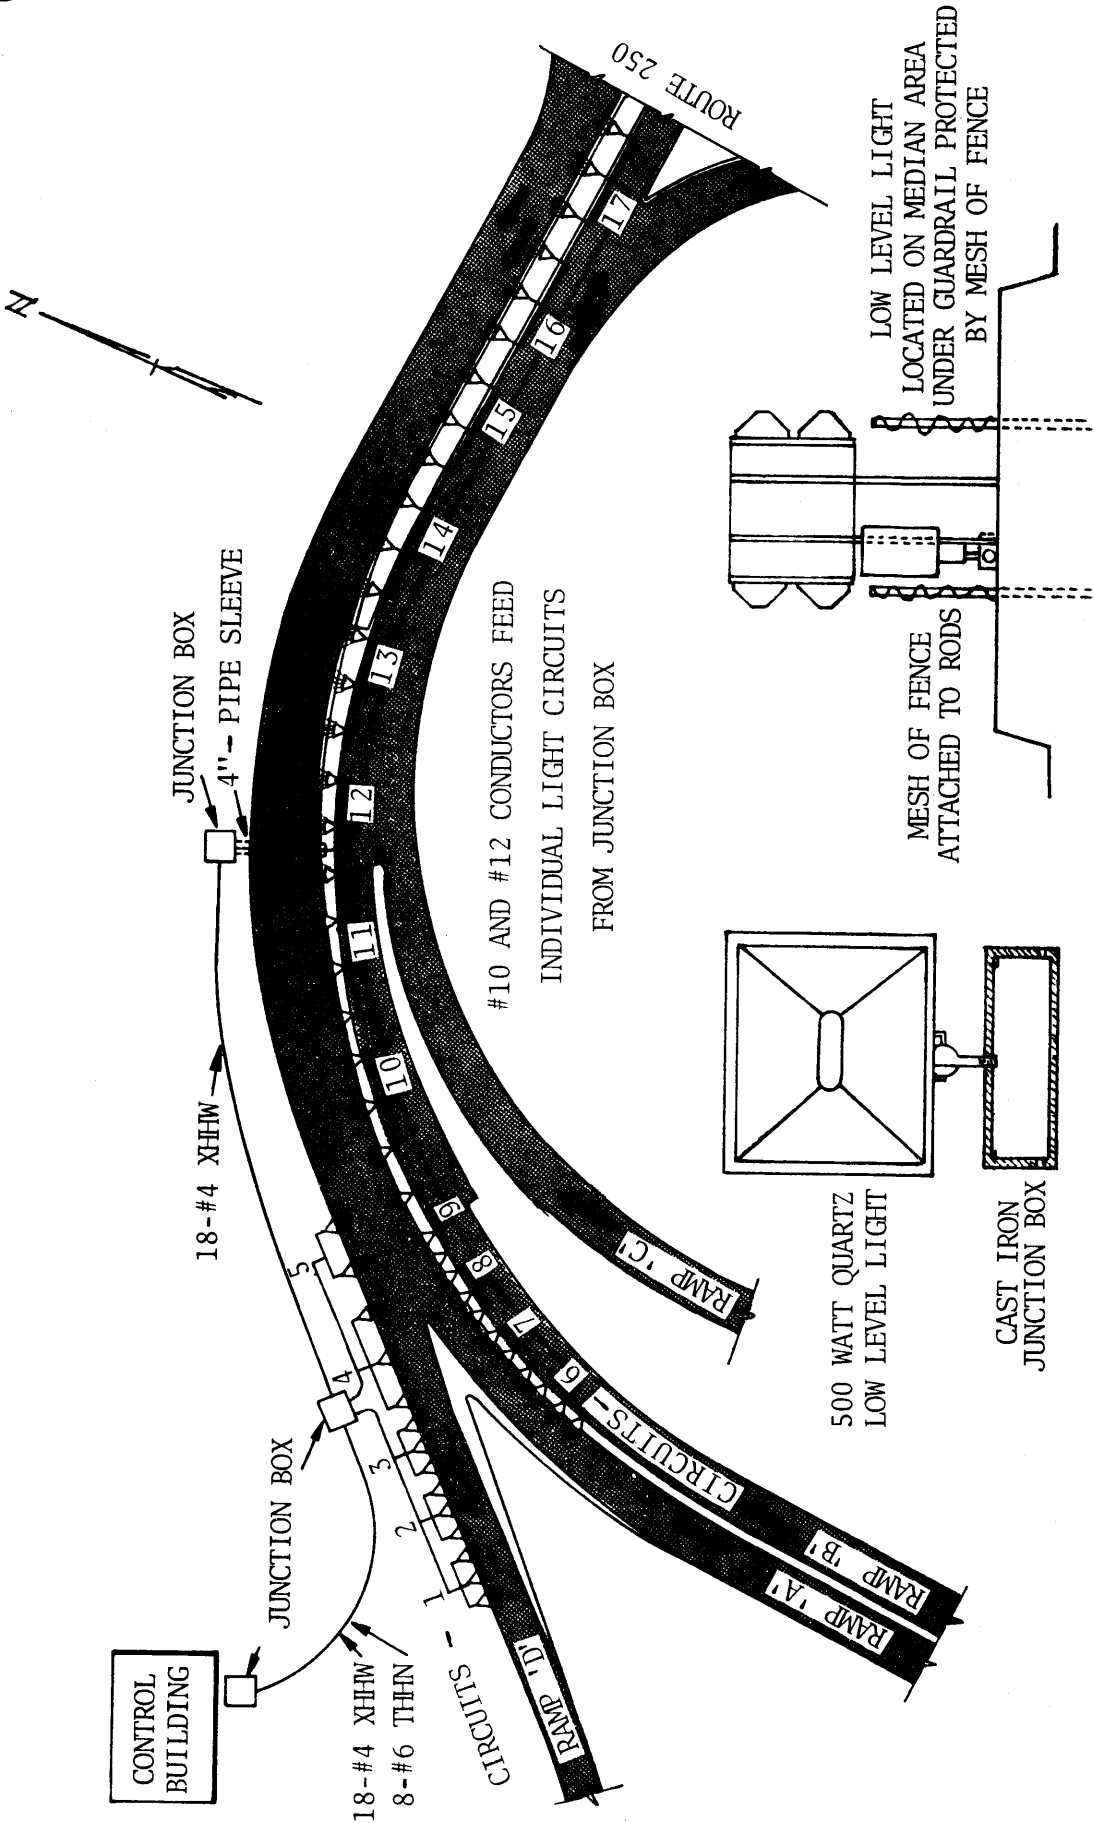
Circuitry and layout of low level lights on entrance ramps 'A' and 'D' at the Afton interchange.
